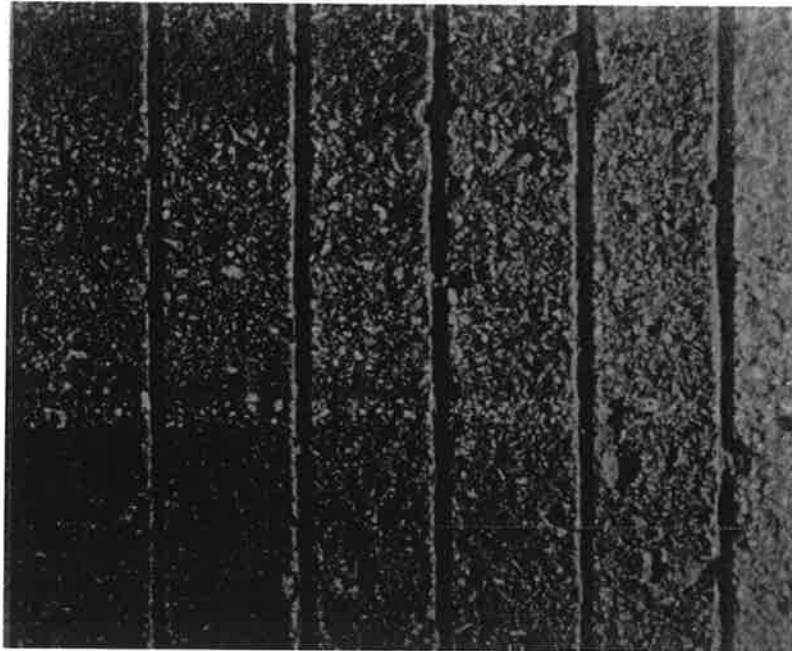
SAWED GROOVES IN HMA PAVEMENT
